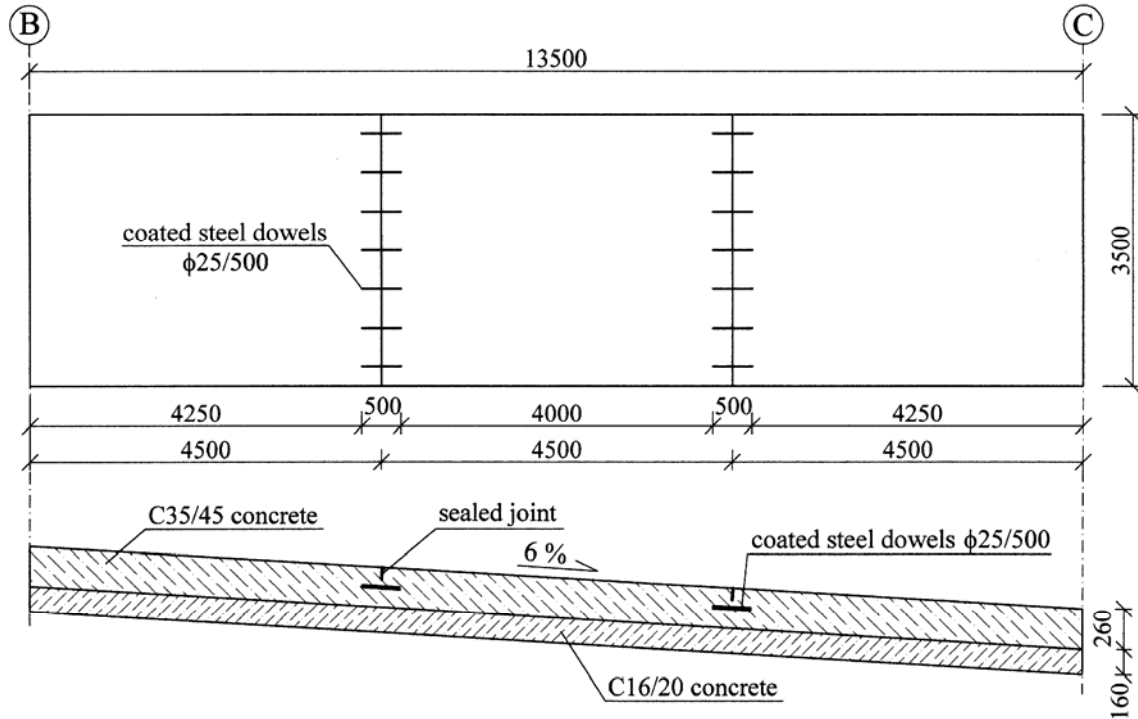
Horizontal and vertical cross section of jointed plain concrete pavement.
